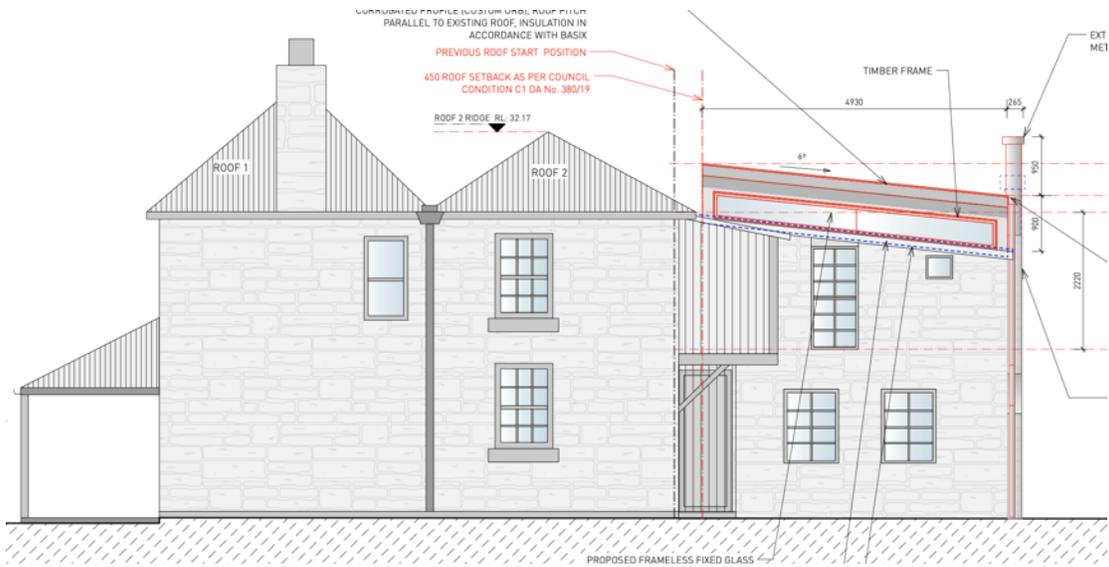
, East Elevation, CC31, U+I Building Studio, 10/02/21,
